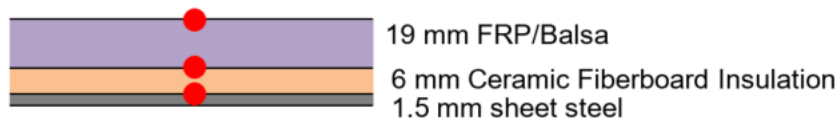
Cross-sectional details for insulated FRP/balsa panel test
